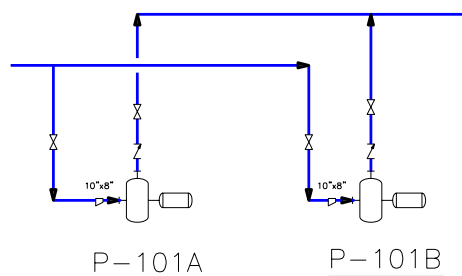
Check valves and gate valves placed on outlet lines of both the pumps
